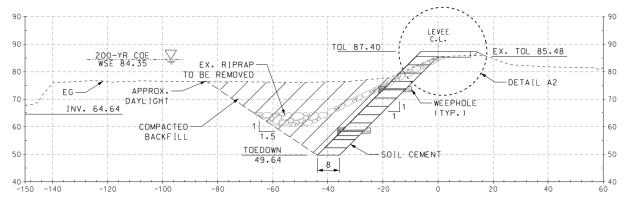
Typical Cross Section of Alternative 1, Soil Cement for 200-Year Flow (Sta. 270+00)
